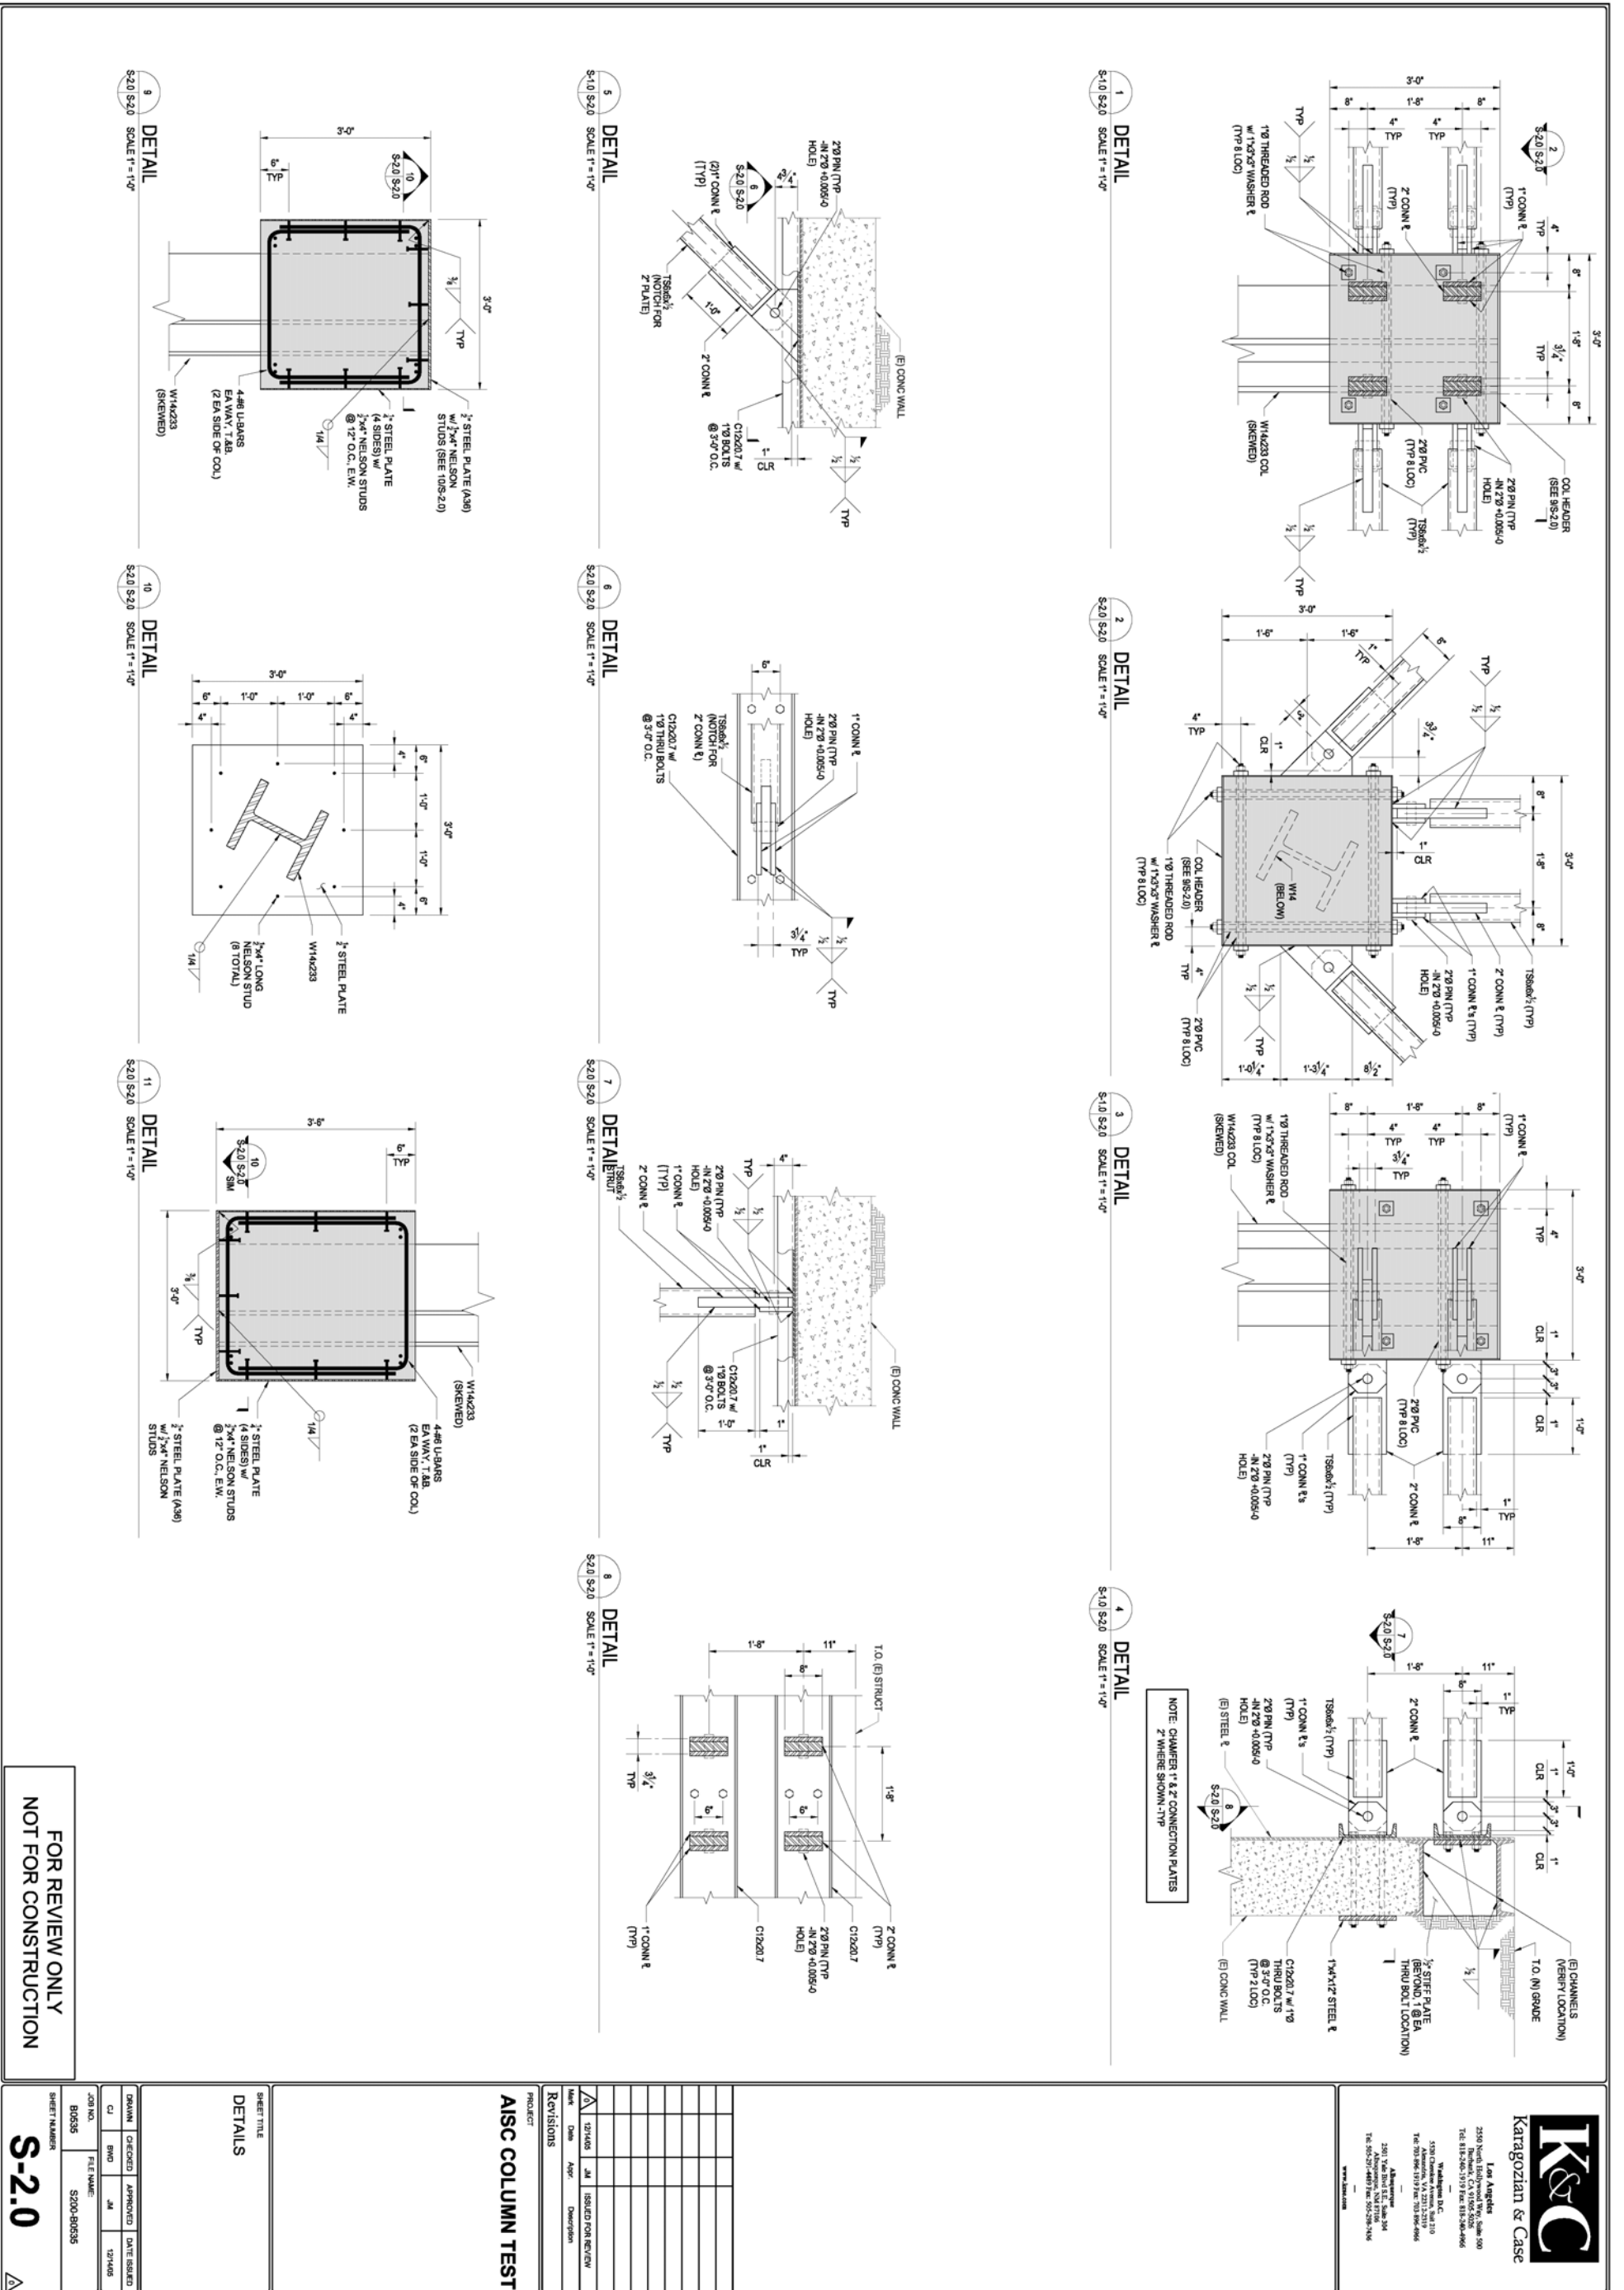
K&C construction documents for AISC Column Test (2 of 2).
